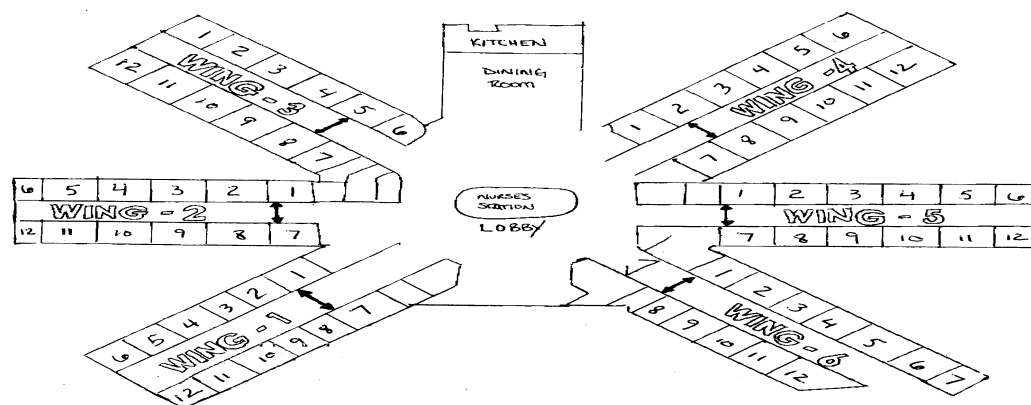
EXHIBIT I FLOOR PLAN OF NURSING FACILITY
